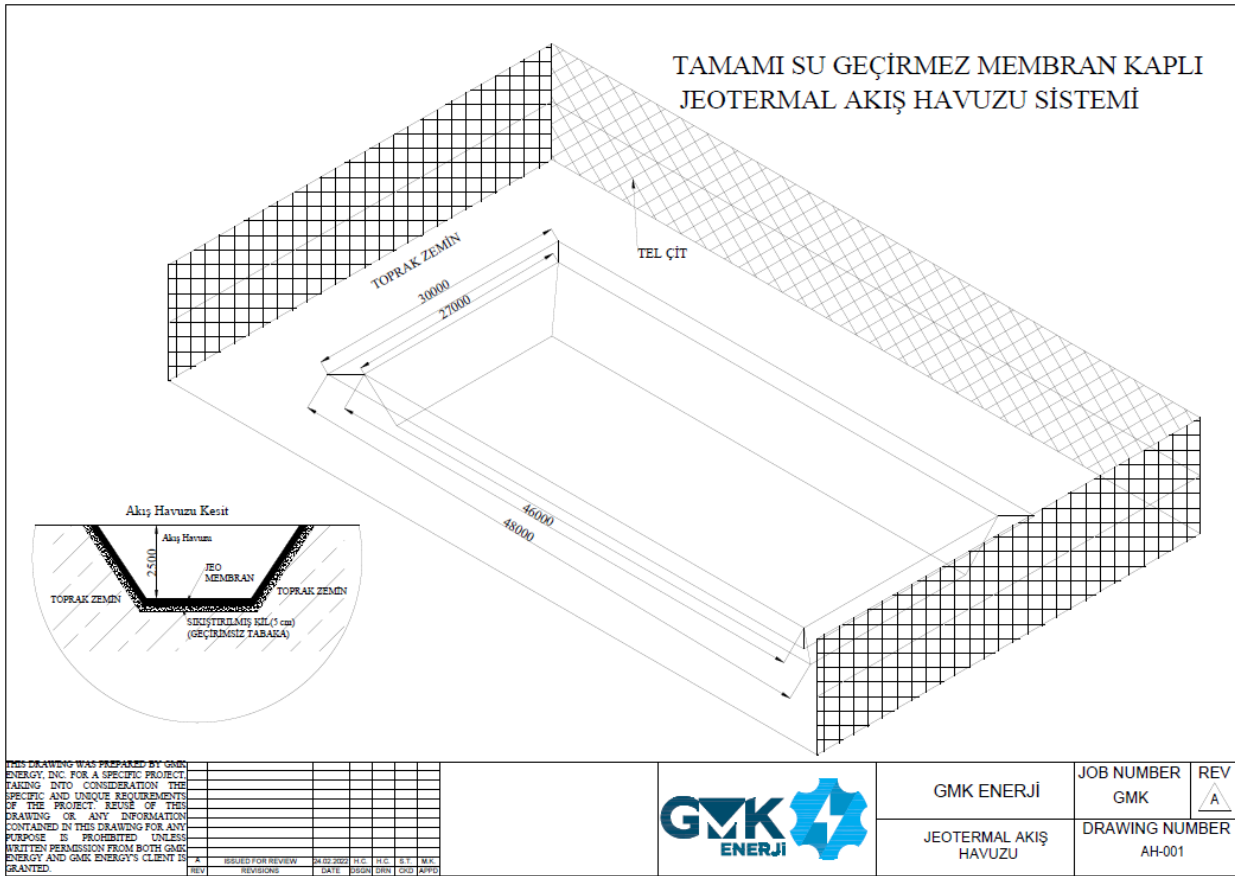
Figure Showing the Geothermal Fluid Pool Planned to be built at Drilling Locations
